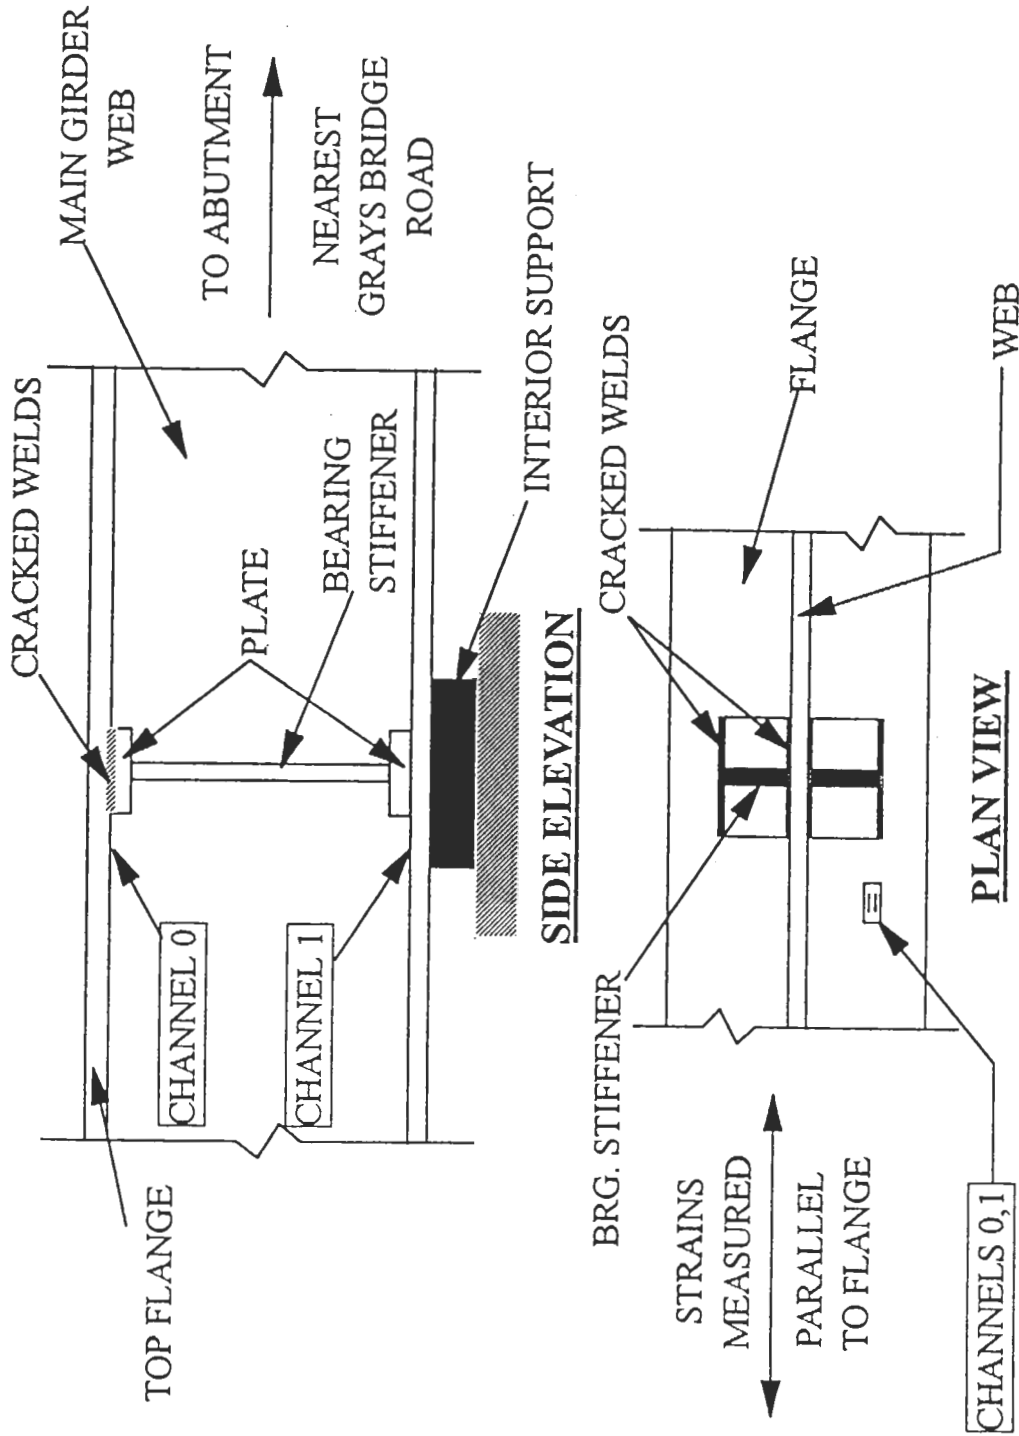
Route 7 Bridge - Cracking And Strain Gage Locations
